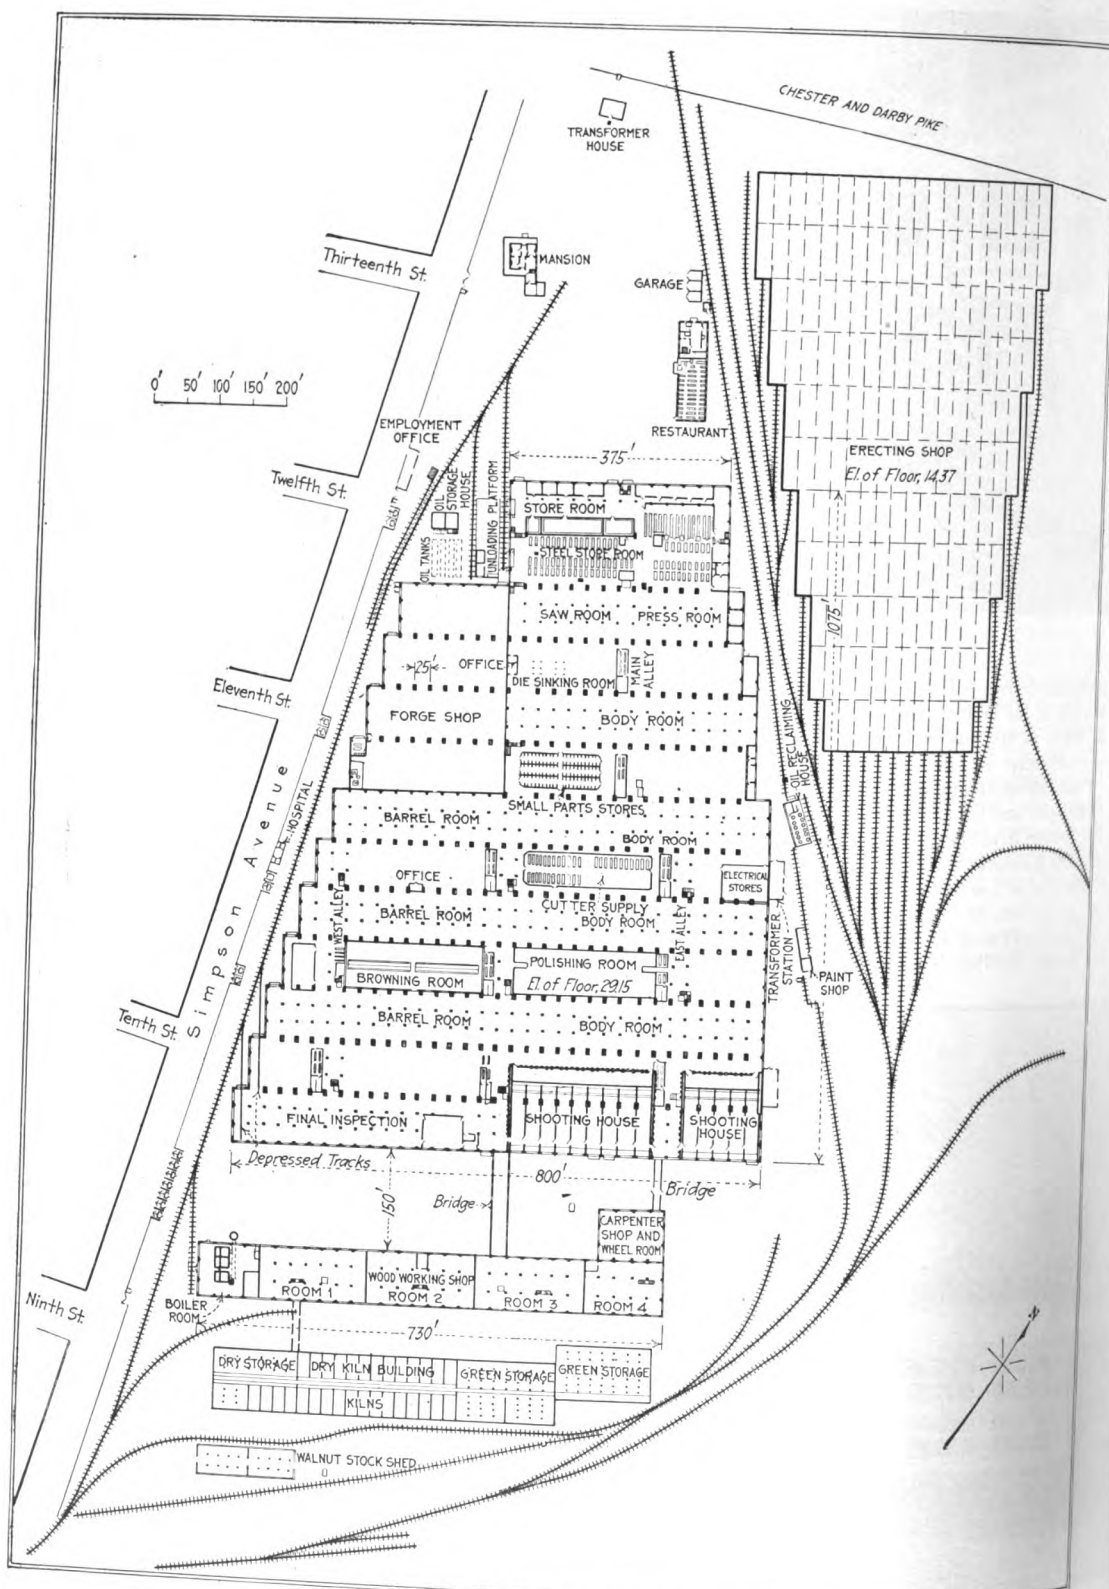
GROUND PLAN, SHOWING DETAILS OF PLANT LAYOUT
